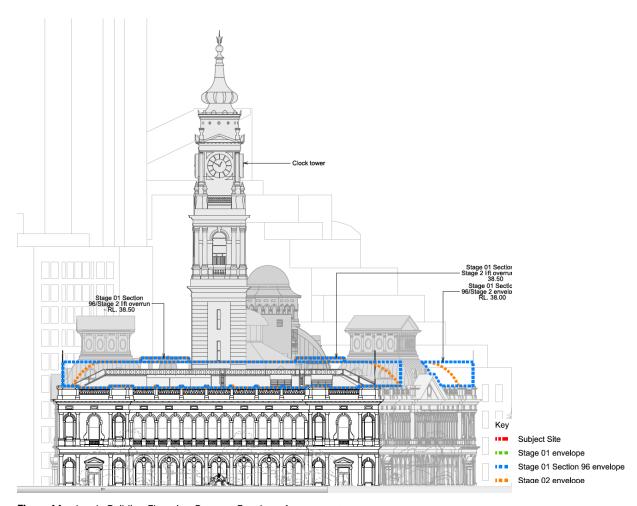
Lands Building Elevation Concept Envelope Assessment Source: MAKE Architecture
